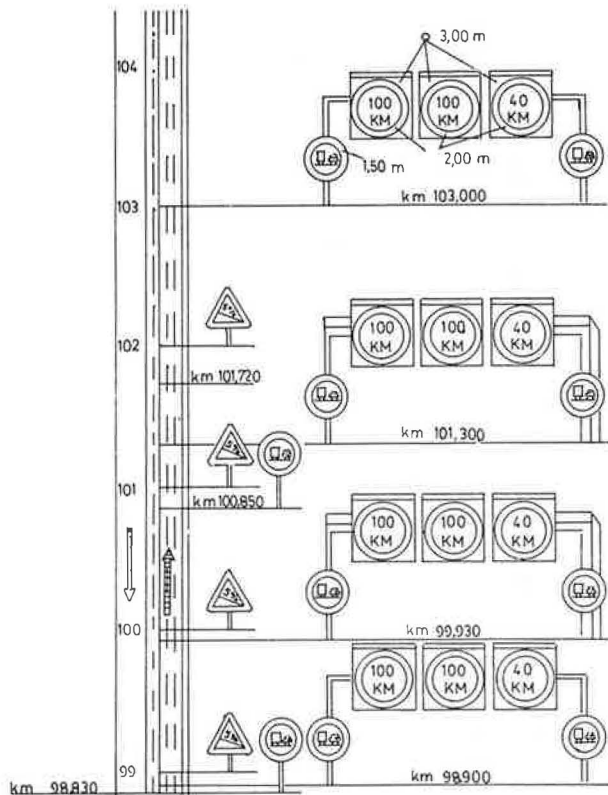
Traffic sign plan for Elzer Mountain, downgrade direction.
